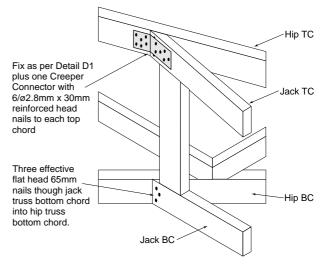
Extended Jack or Hip Truss to top chord of Truncated Standard Trusses
